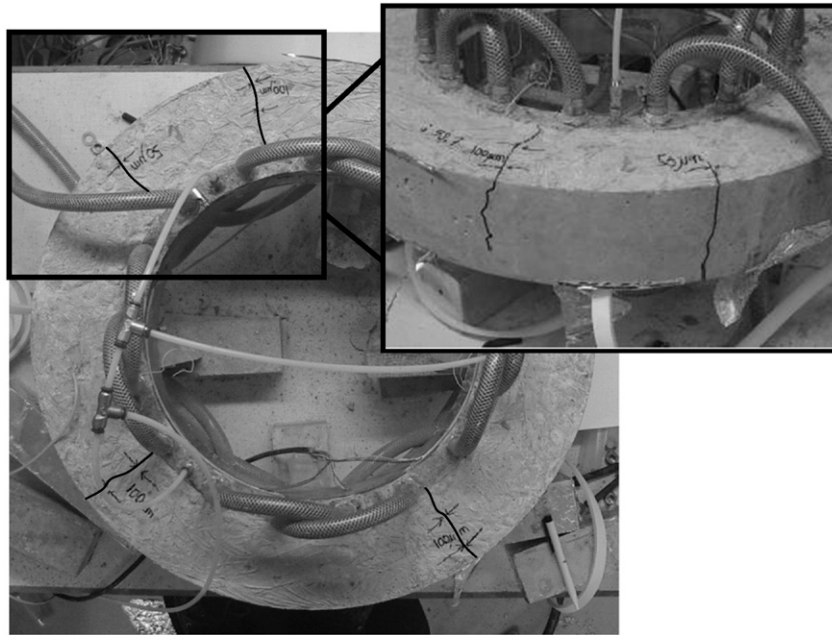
Cracks location in the reinforced concrete ring at the end of the test.
